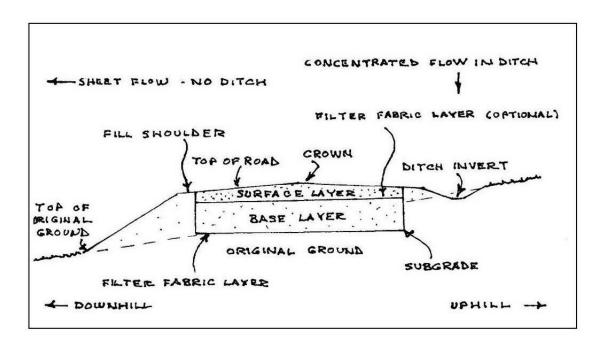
Typical Road Cross-Section - Canaan, NH Highway Department
